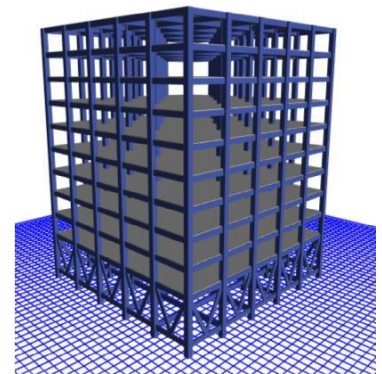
Soft Storey at First Storey with Shear Walls at Corners
